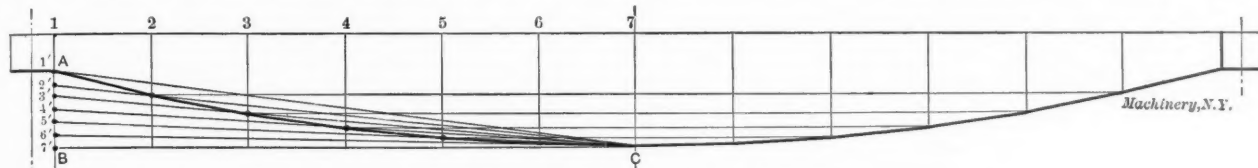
Laying out a Girder of the A Type, Fig. 24
